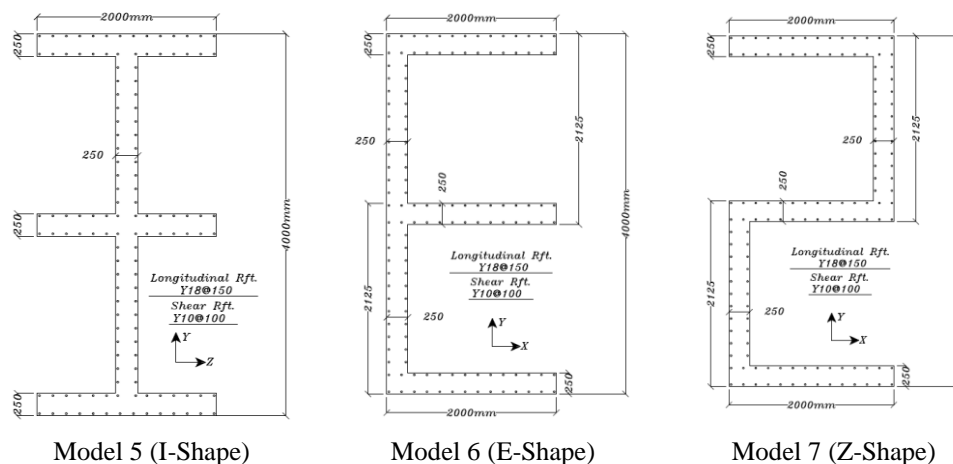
Concrete dimensions and steel reinforcement of cores cross section for (I, Z, and E) models
